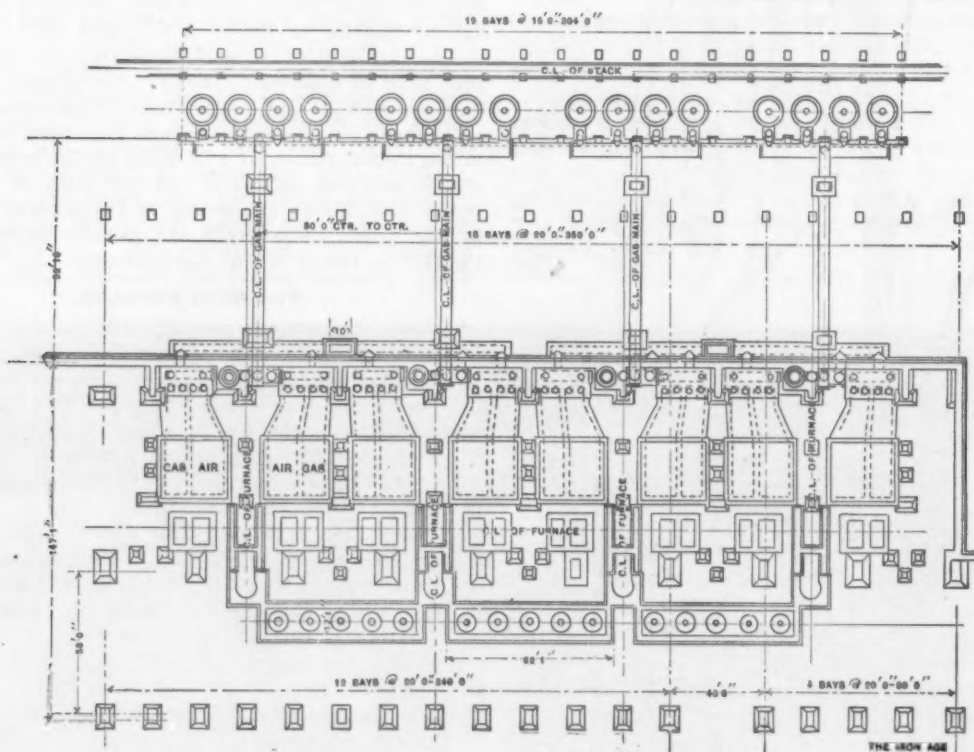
Plan of Open Hearth Furnaces and Gas Producers.
